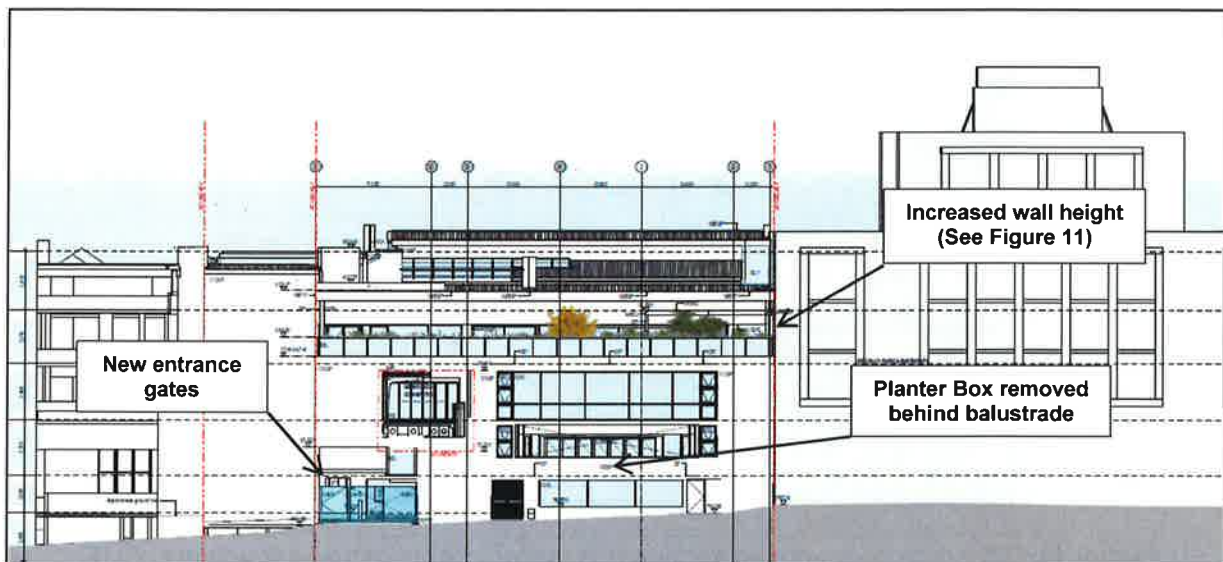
Extract from proposed Elliot Street elevation (source: Application documents, 2018)
